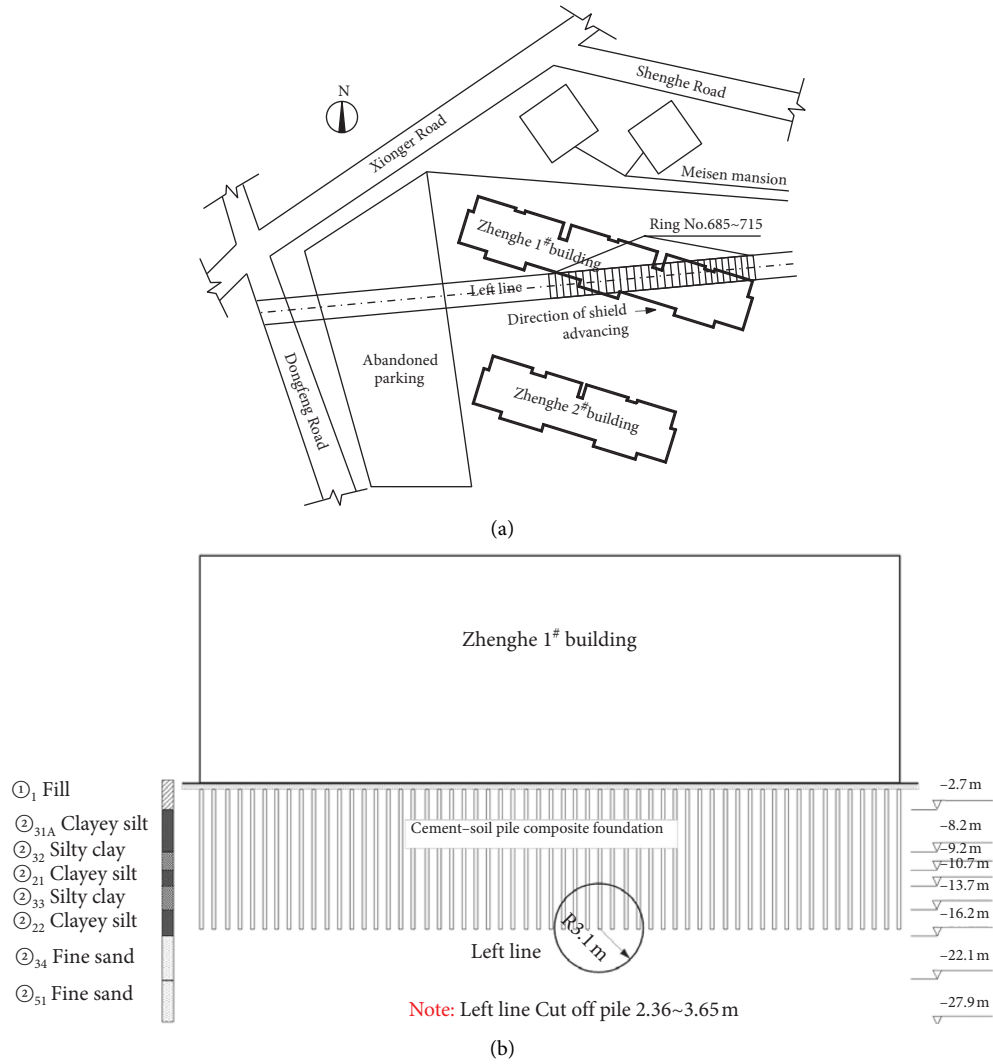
Relative position of the Zhenghe 1#: (a) schematic plane location of the tunnel and Zhenghe 1# building; (b) schematic elevation of the tunnel and Zhenghe 1# building.
